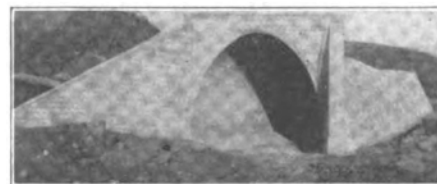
Standard Reinforced Concrete Arch Culvert, C. M. & St. P. Ry.
